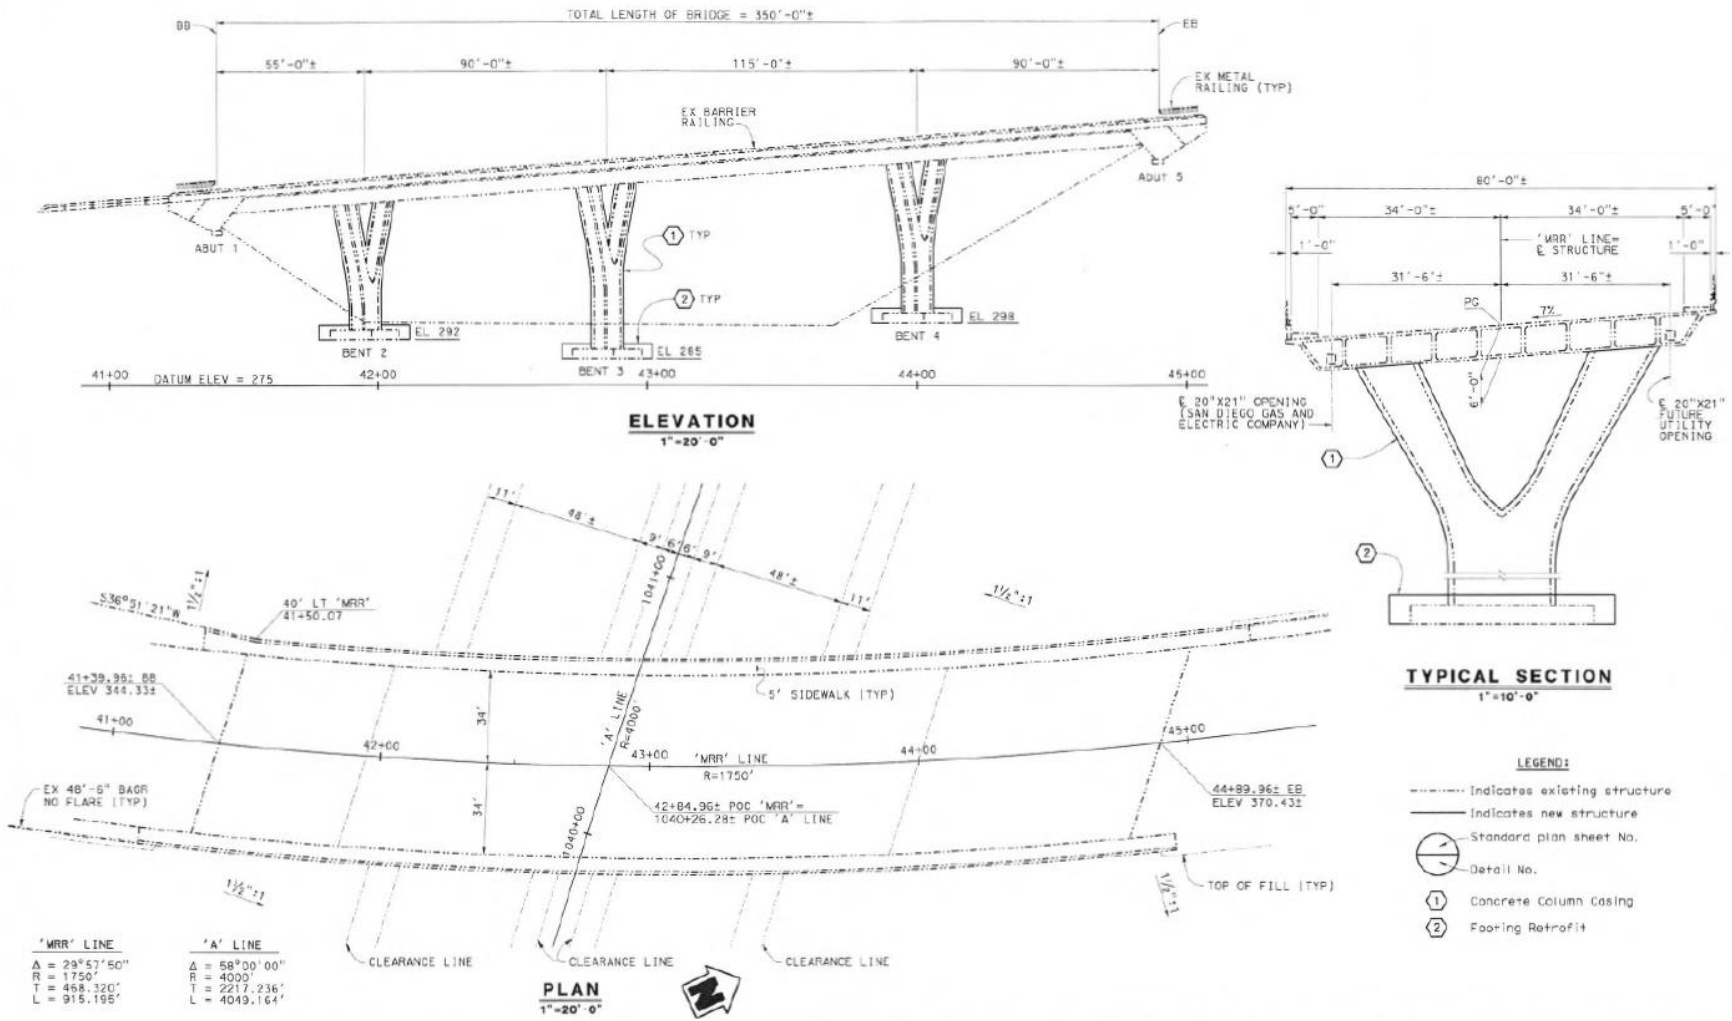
Plan, elevation and typical section view of the Murray Ridge Bridge [Caltran's drawings].
